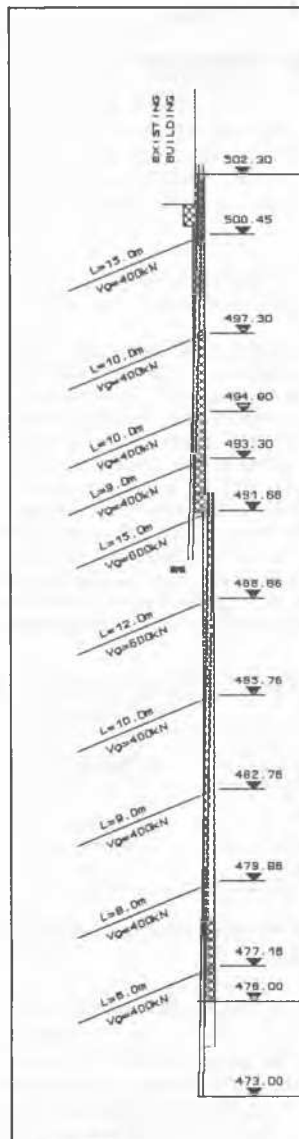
Typical Cross Section of the ERS at Chauderon.
